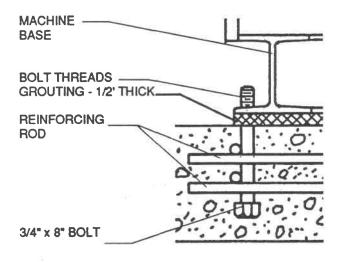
FIGURE II-G: TYPICAL METHOD OF MOUNTING USING BASE FRAME
